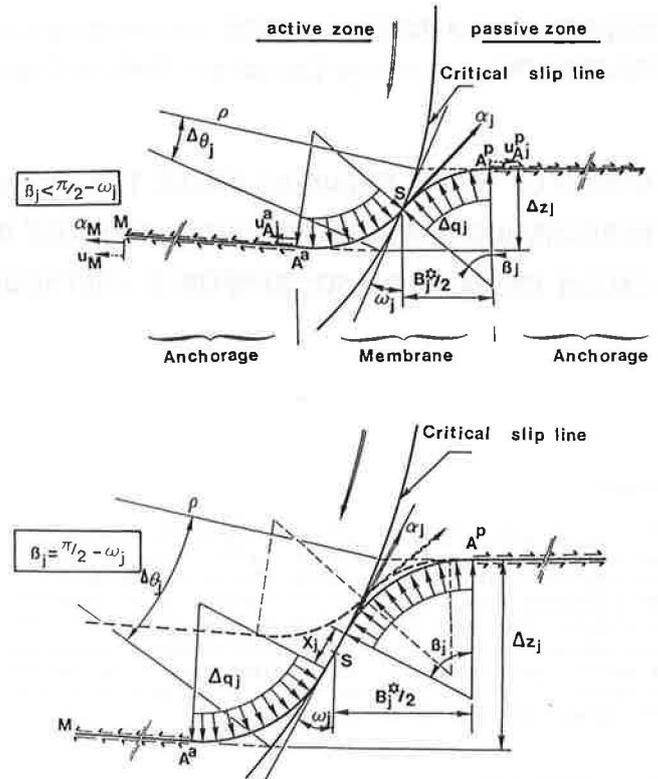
Local behaviour of geotextile close to slip surface - anchored membrane
